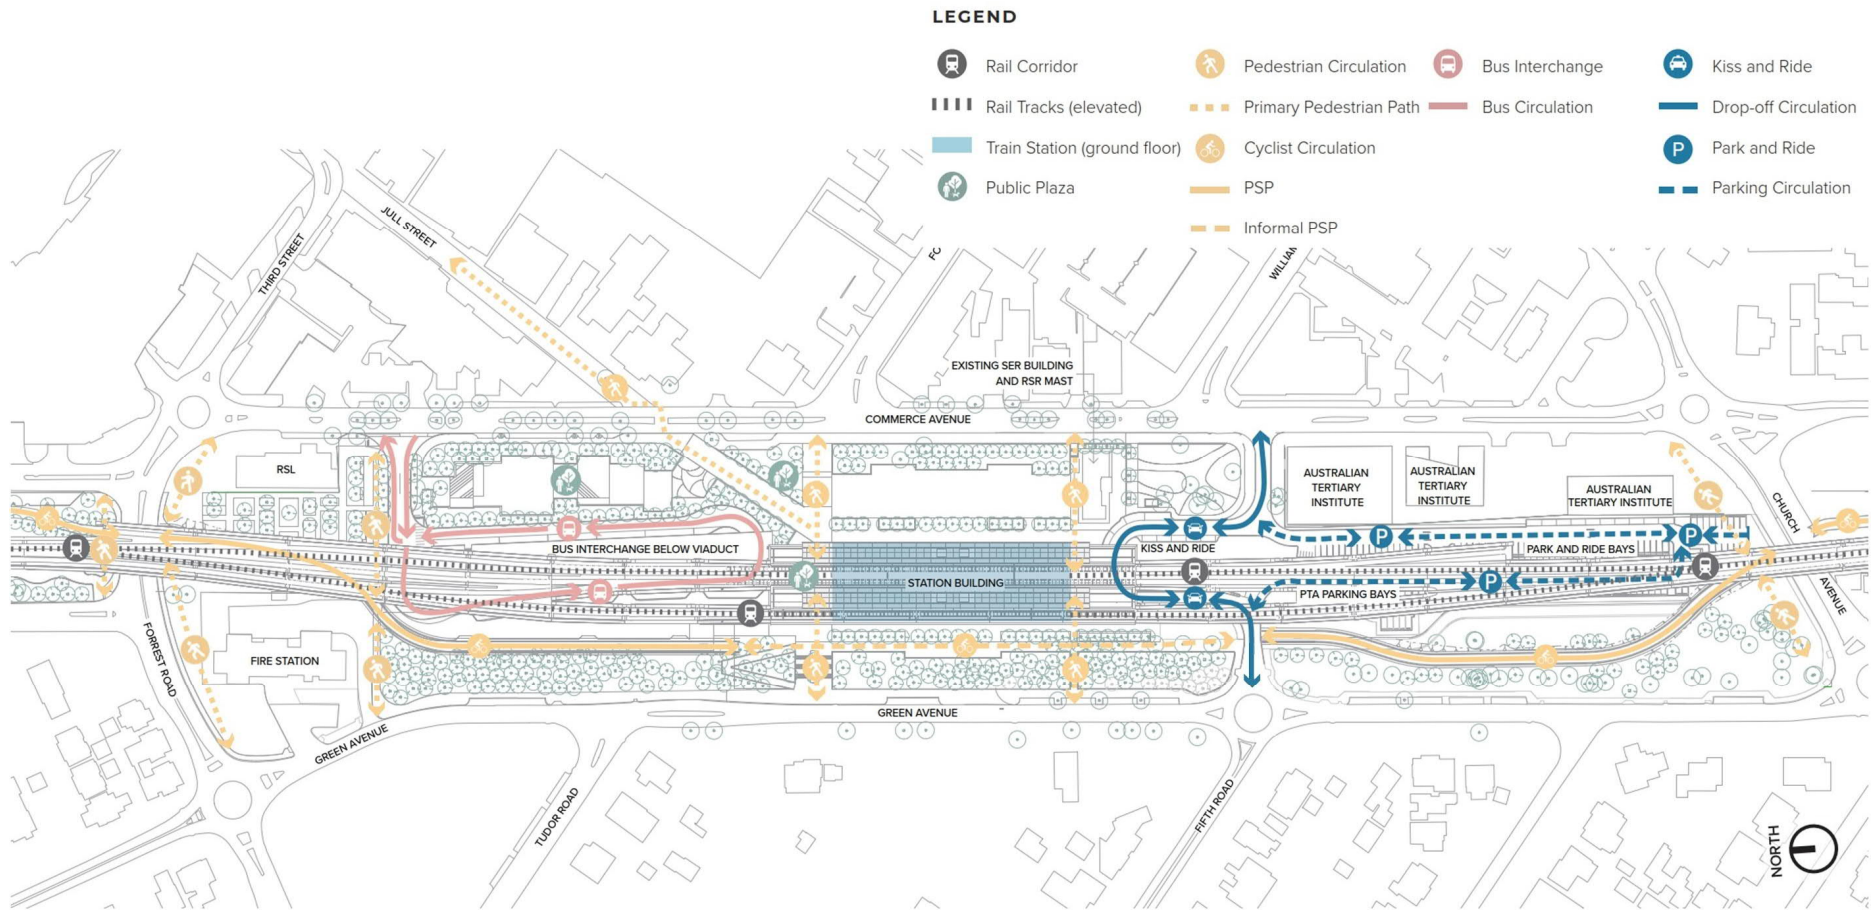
Armadale Station – transport journey and accessibility plan (MetCONNx)
